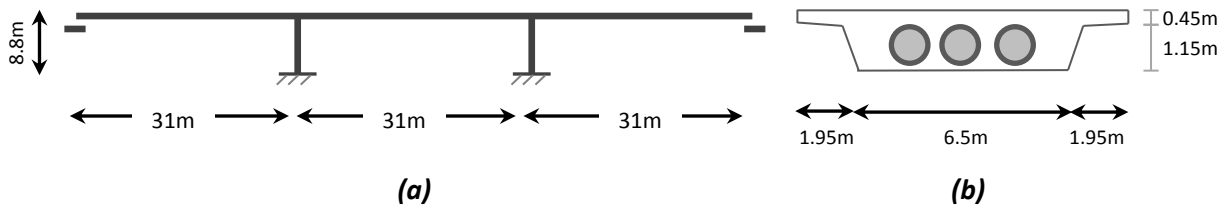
(a) geometry of the bridge and (b) section of the deck
